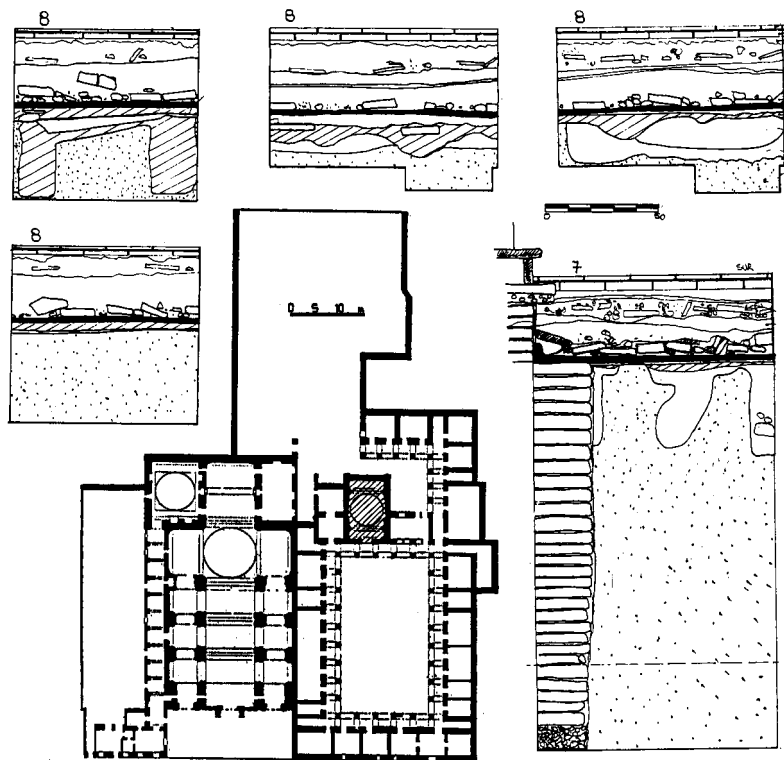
Excavations at the San Telmo church and residency: plan of the original architecture that still stands. Stratigraphies made inside the Chapel of Belén show a layer that corresponded to the original floor (unbroken lines) of a Jesuit blacksmith's workshop around 1740 (oblique lines), together with objects that were forged in the blacksmith's workshop found under the chapel (facing page) (based on a plan by Alberto de Paula).
